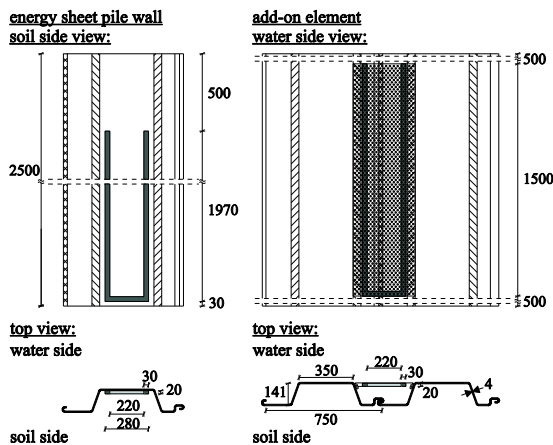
Schematic illustration of a sheet pile section and an add-on element in the test station
